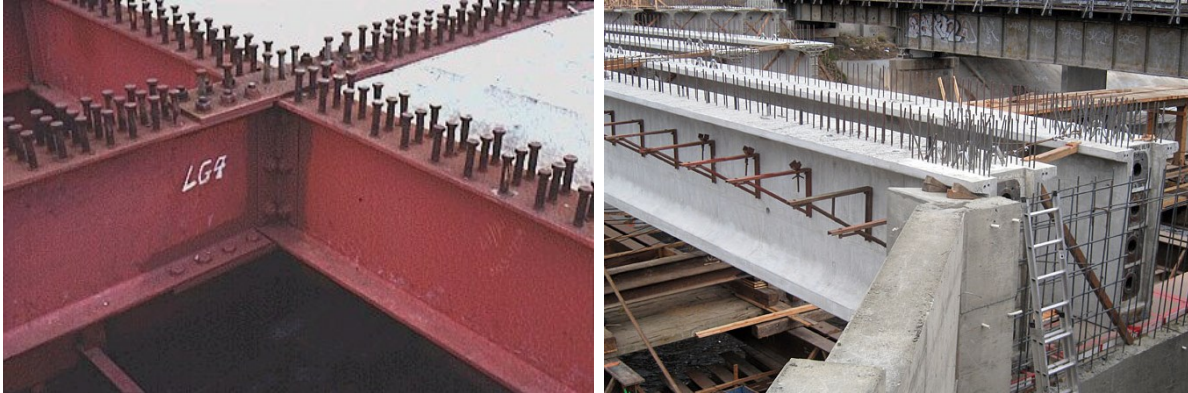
Steel shear connectors fixed to the top flange of steel and concrete girders
